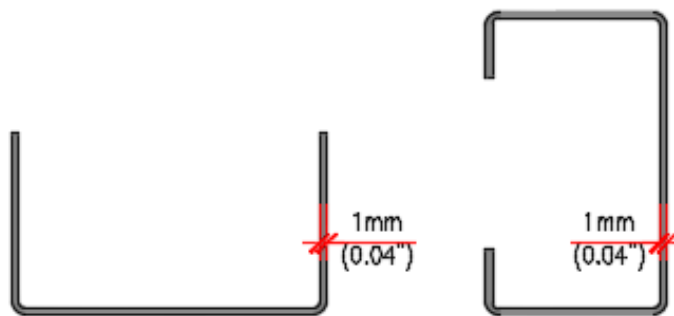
Section type of structure in galvanized steel (Channel)
